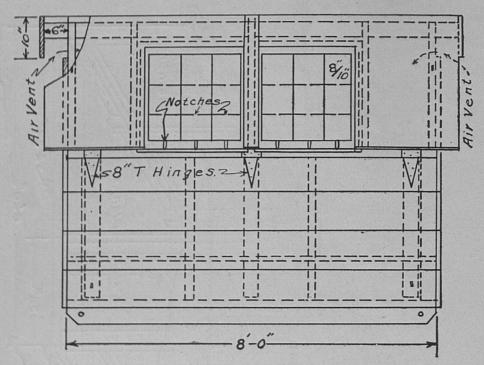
Kentucky Sunlight Hog House C 6-94-1, front elevation.
